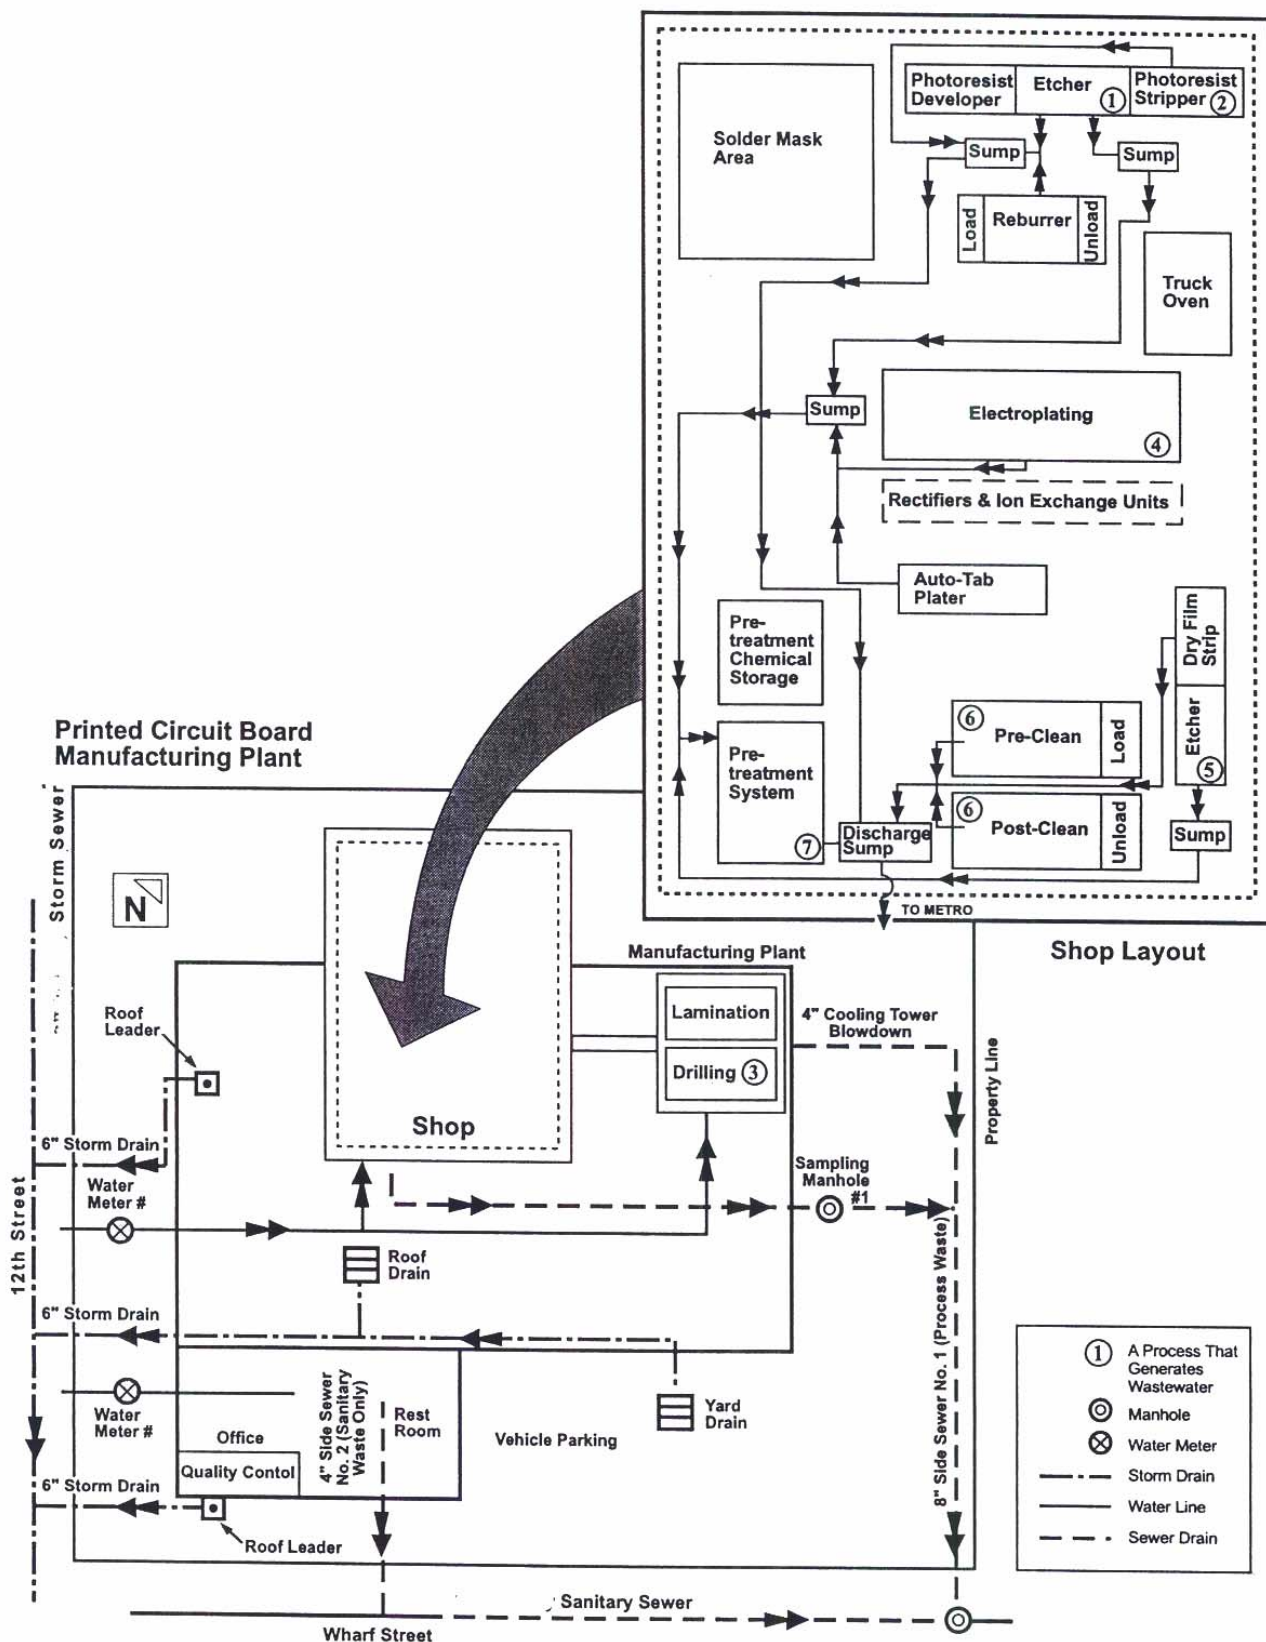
EXAMPLE SITE LAYOUT FOR EXHIBIT B
